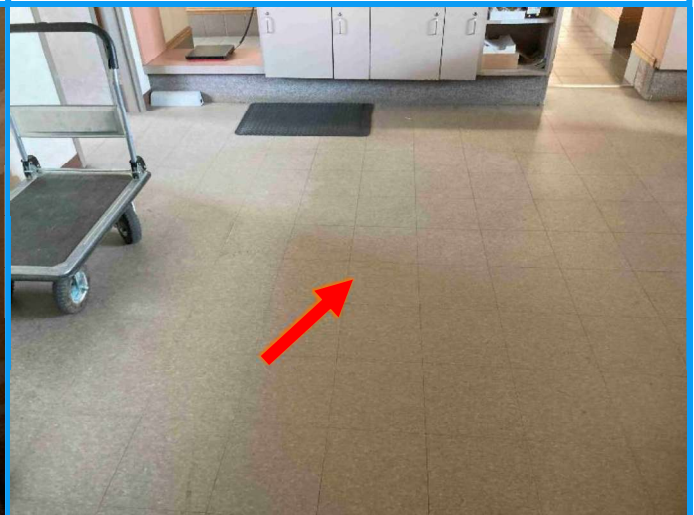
Typical view of the non-asbestos containing 12"x12" grey with darker grey and white specks vinyl floor tiles (see arrow) observed throughout the subject building.
